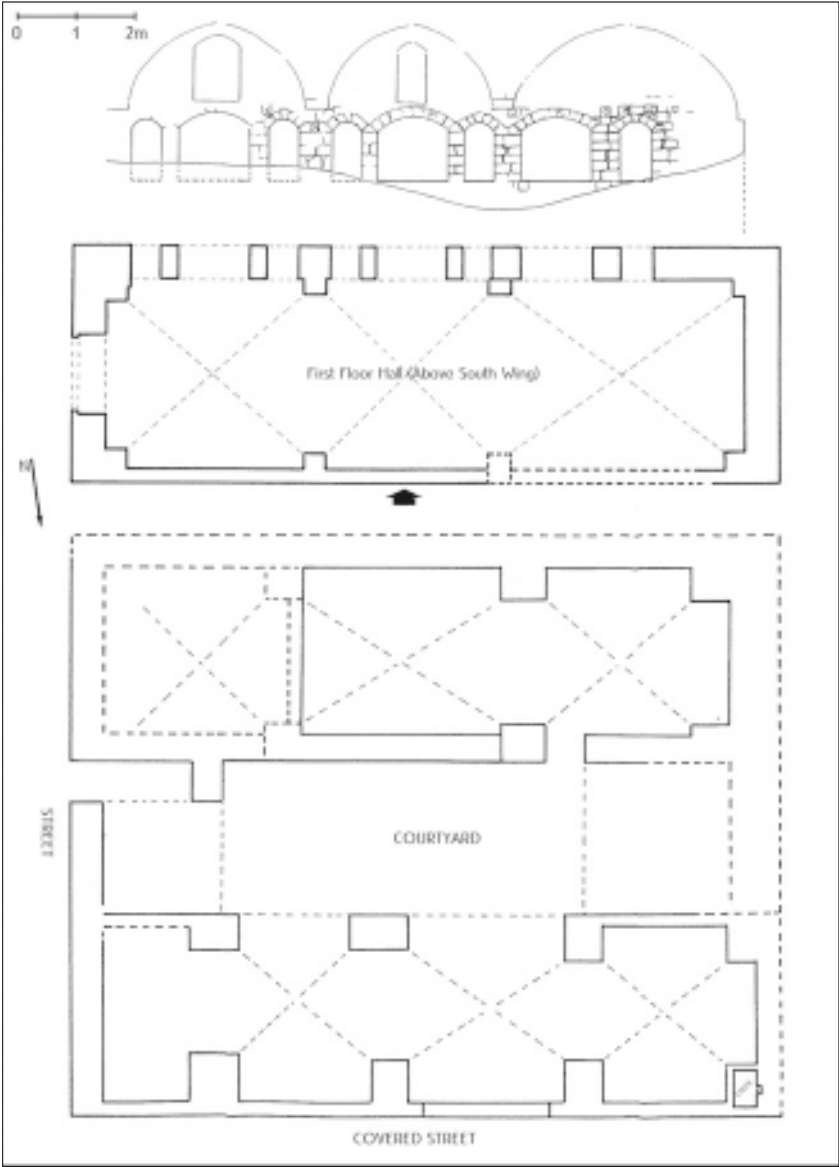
Plan of courtyard house in Genoese quarter, Acre (House 1:20)
